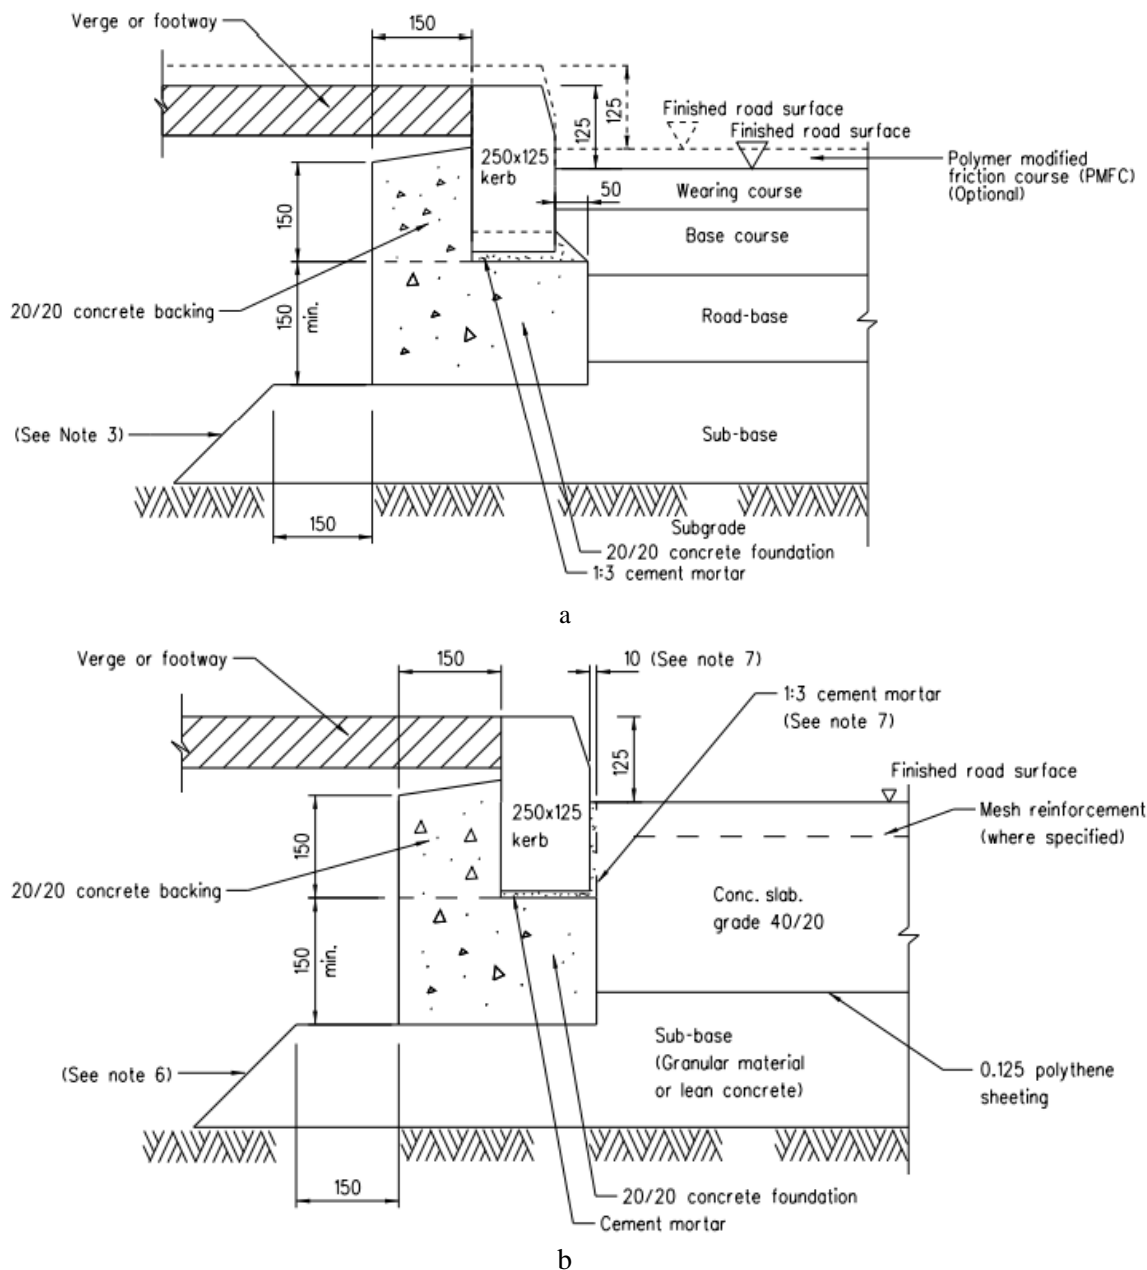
Guidelines on typical road structures: (a) is a section of bituminous road and (b) is for concrete roads from Highways Department of HKSAR Government (HyD, 2017a, 2017b)
